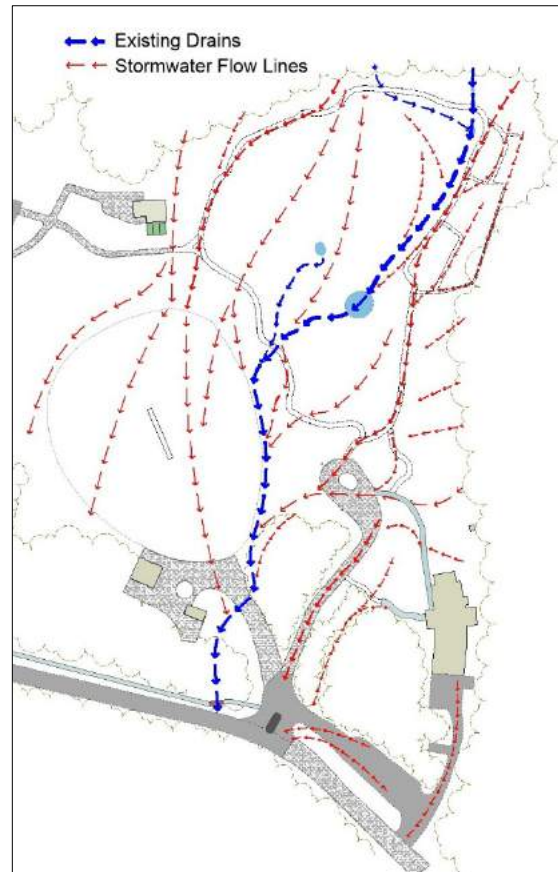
Existing Drainage - Blue lines indicate existing drainage; Red indicates stormwater flow. (Note: stormwater flow lines are approximations only, based on observation and photos)
